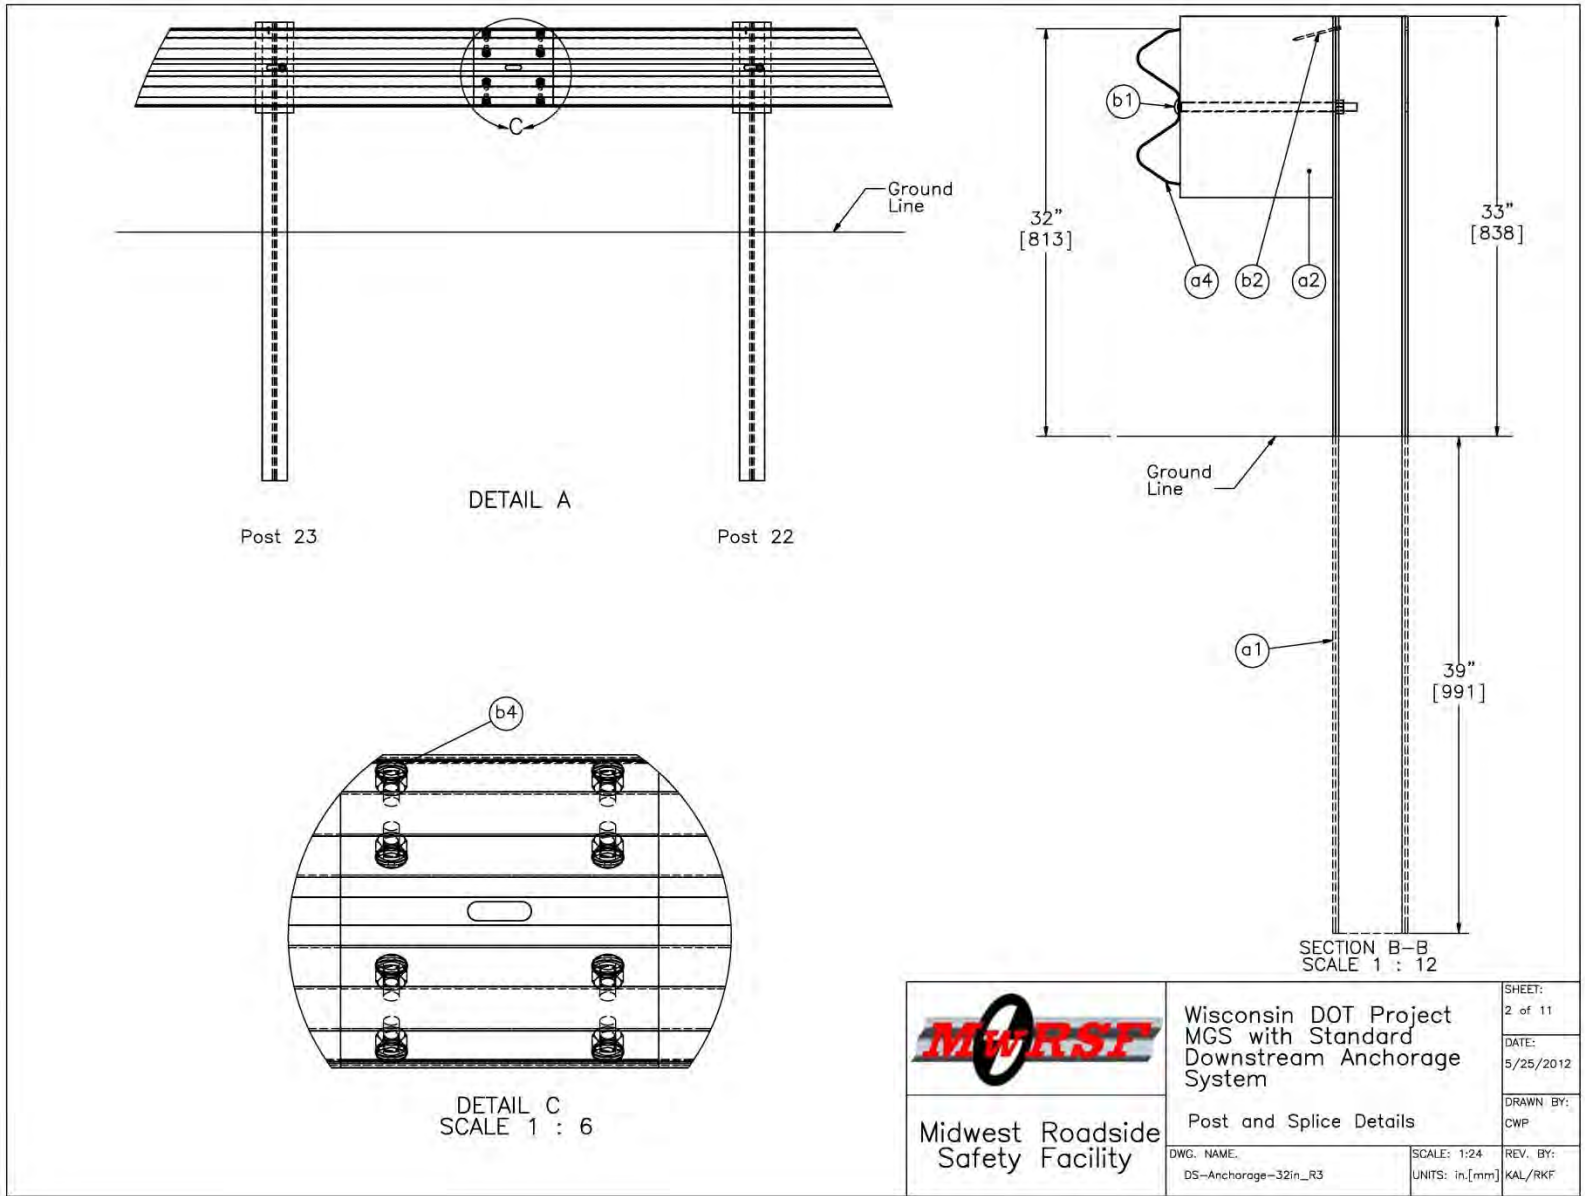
32-in. (813-mm) Tall Blocked MGS Details, Test No. WIDA-2
